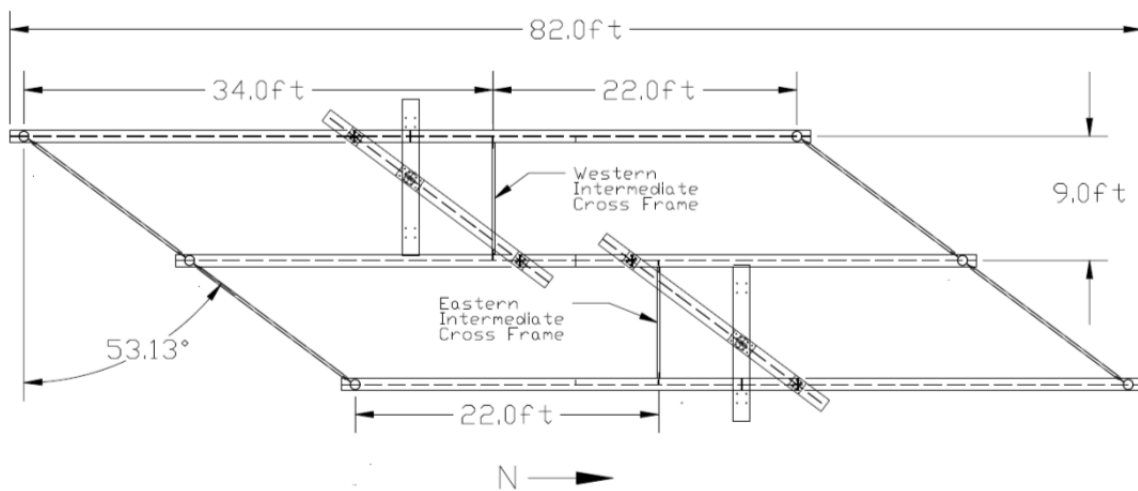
Plan view of 53° skew GSP specimen with staggered intermediate cross-frames
